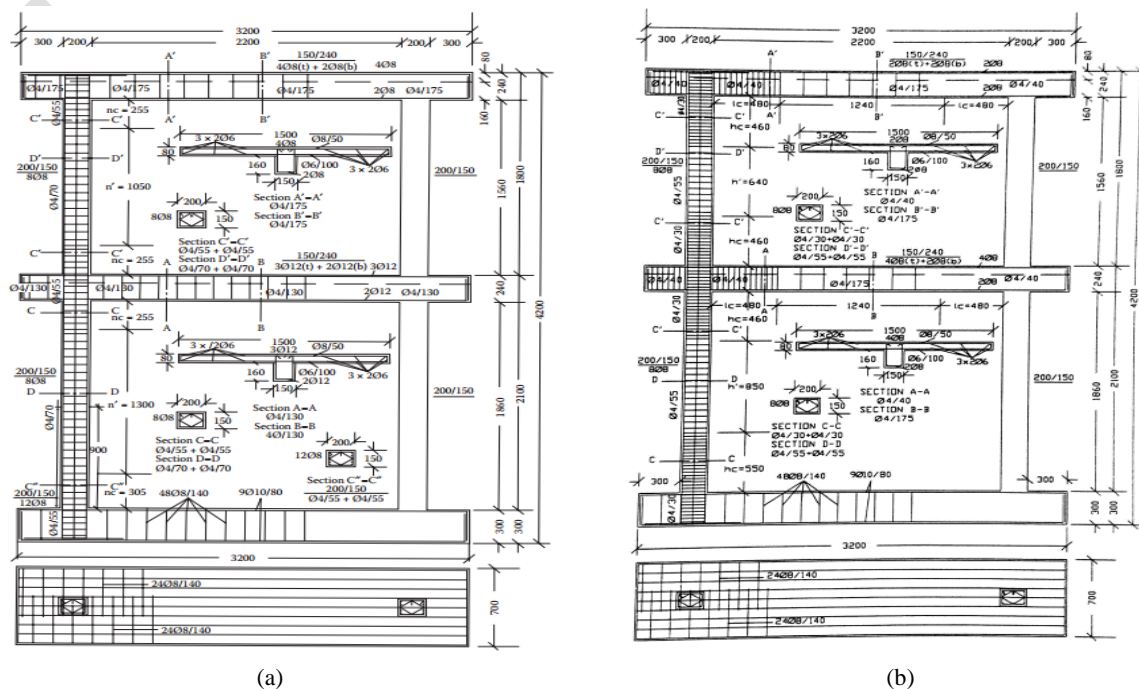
Geometric and reinforcement details of specimens of the RC-frames. (a) L30 and (b) H30.
